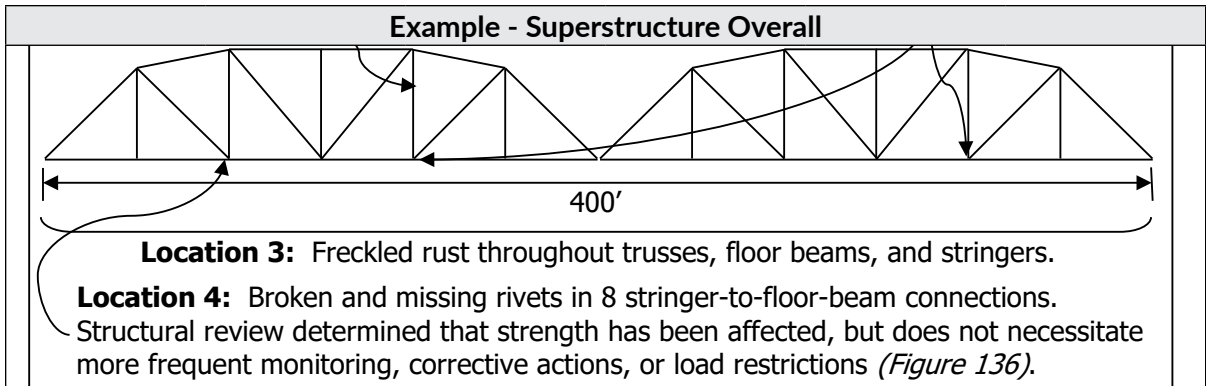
Elevation view of a truss bridge showing superstructure defect locations.
